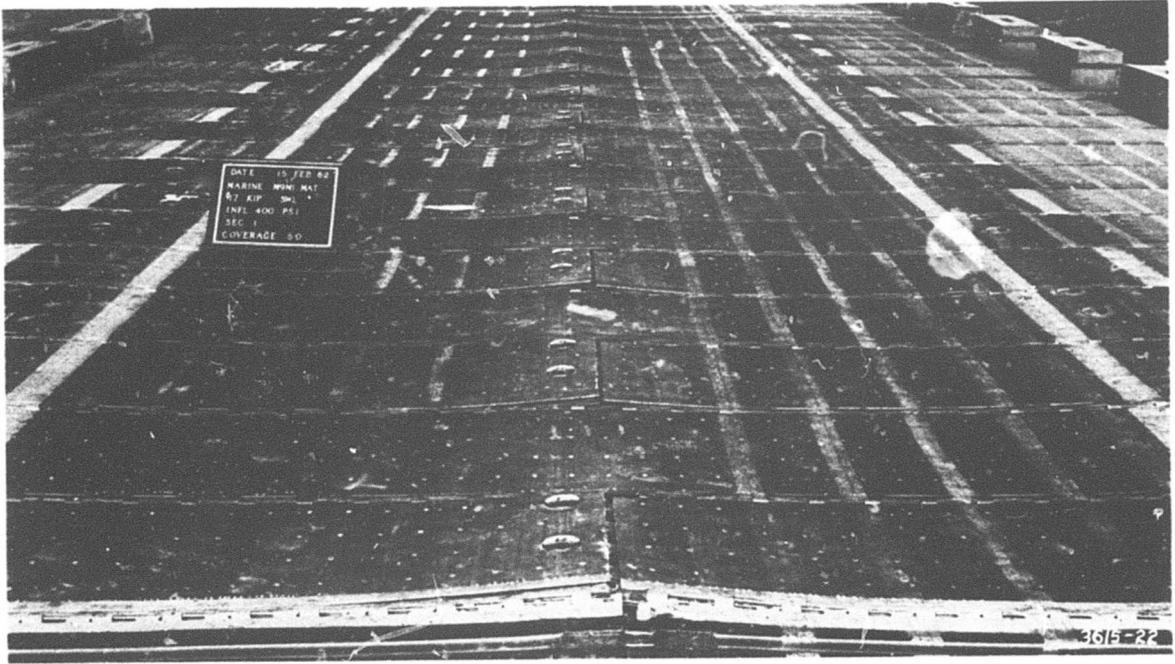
Test section with end joints in straight line after 6 coverages. Note deformation of planks
